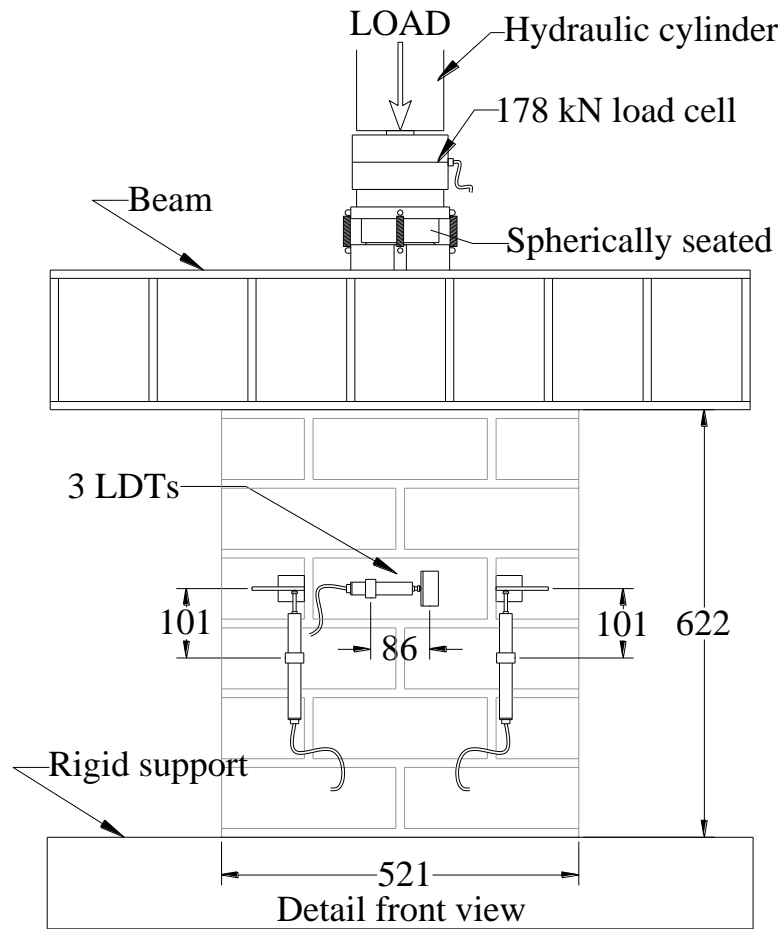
Test setup for compression test on earthen masonry wallettes, front face. Dimensions in mm.
